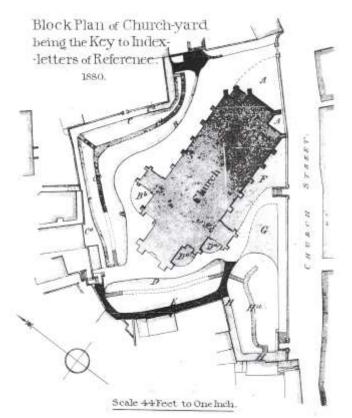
Plan of the church and Churchyard. John Blood 1880.
